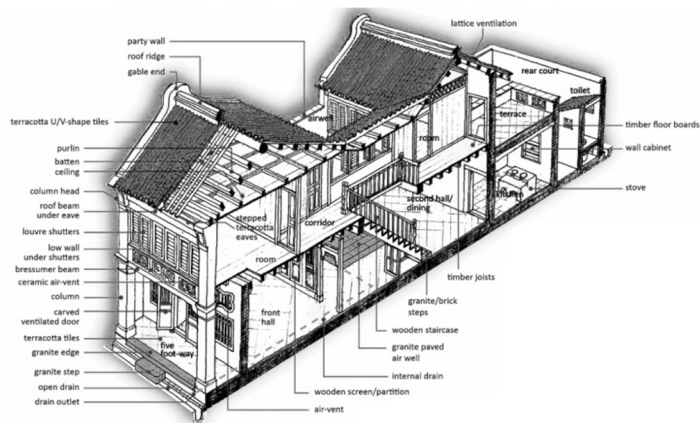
Sectional layout of a typical *Peranakan* shophouse [21]–[24].
